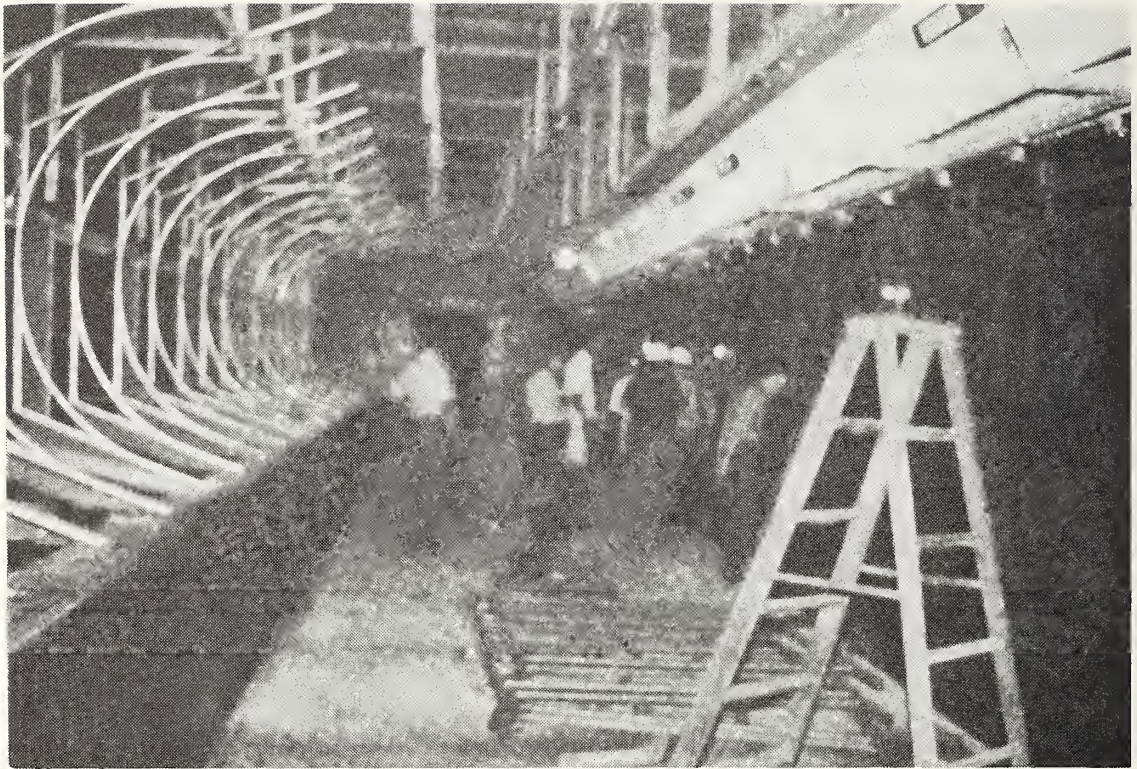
THE PPA SITE-VISIT TEAM AT THE 63RD STREET STATION
